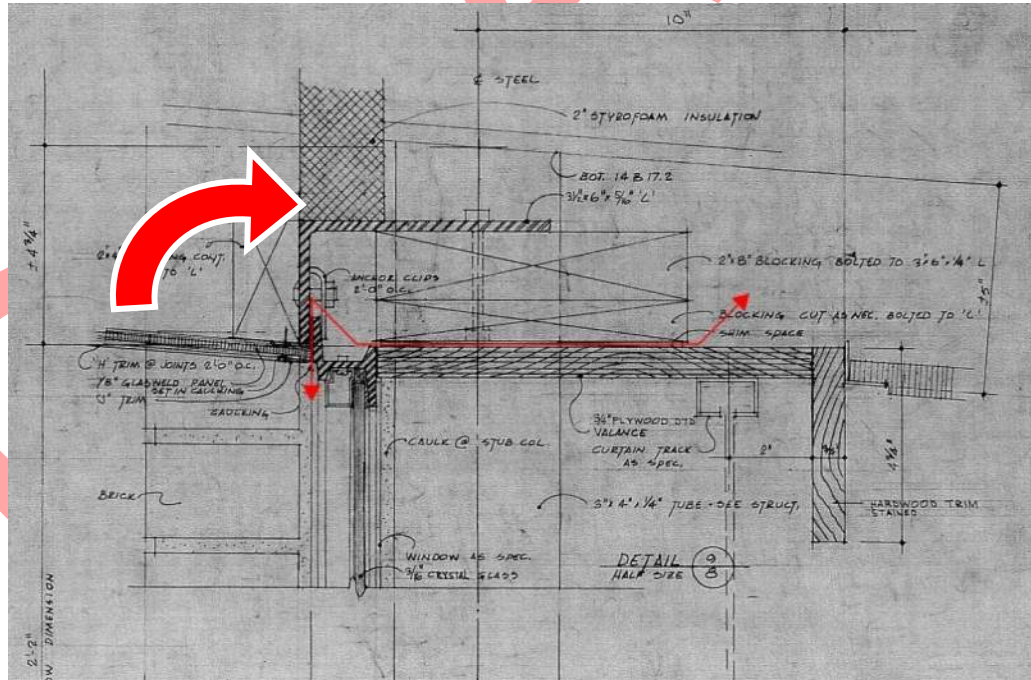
Typical window head section detail. Detail taken from 9/8 of the 1968 Drawings. Arrow indicating potential air infiltration path.
